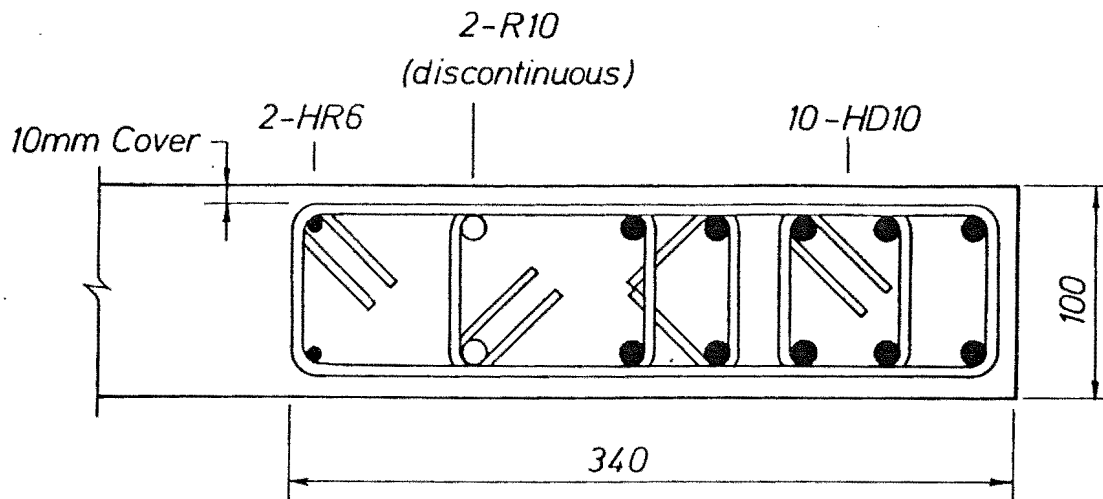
Tee Section East End Hoop Reinforcement Details.
